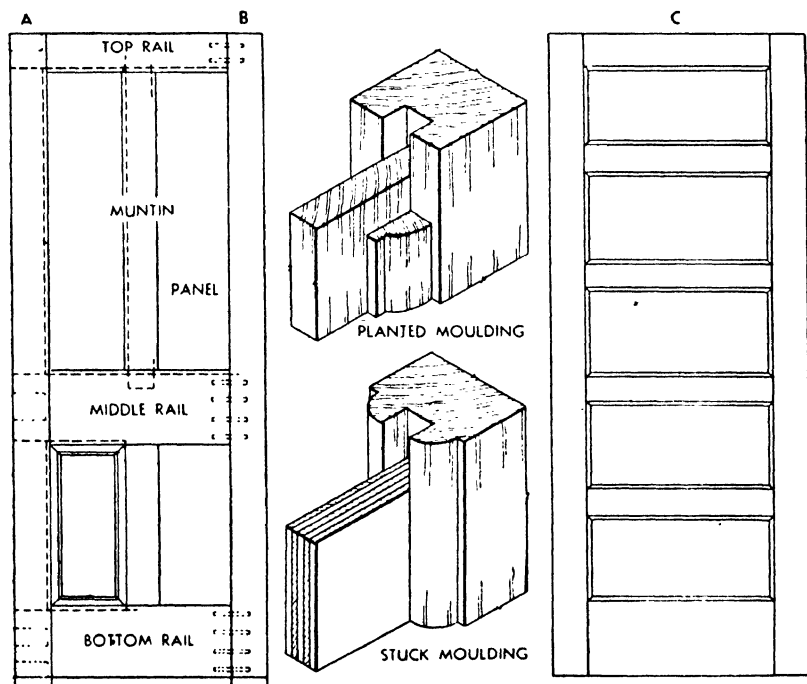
Internal panelled doors mortised and tenoned as at A or dowelled as at B; C. alternative treatment of panels. The details illustrate how a door may have its moulding planted or moulded in the solid wood.
